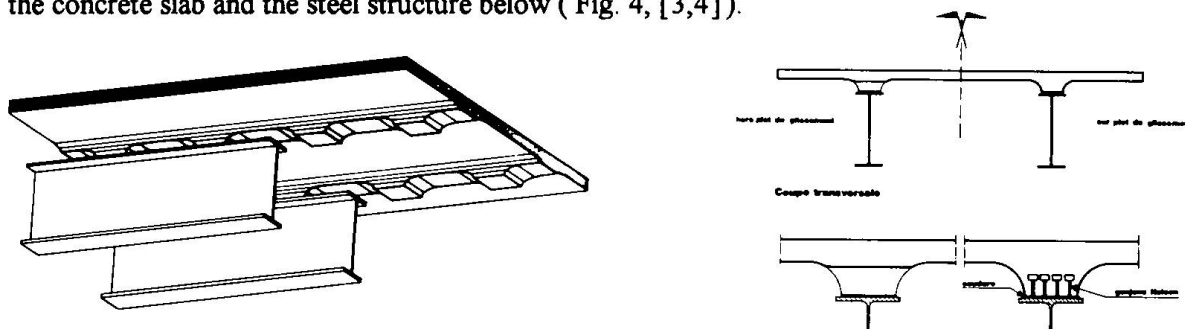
The solution proposed for the bridge over the river Truyère at Garabit.
